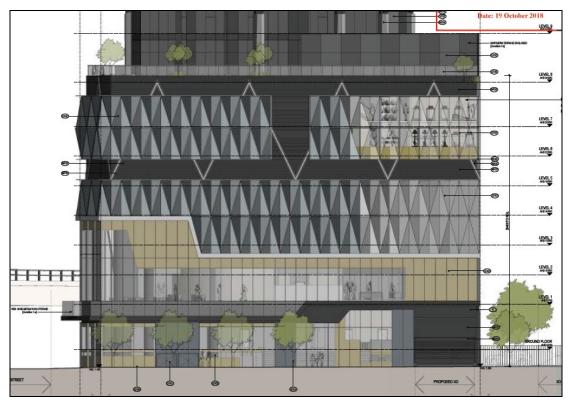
Endorsed Queens Bridge Street elevation extract. From Drawing TP02.07
